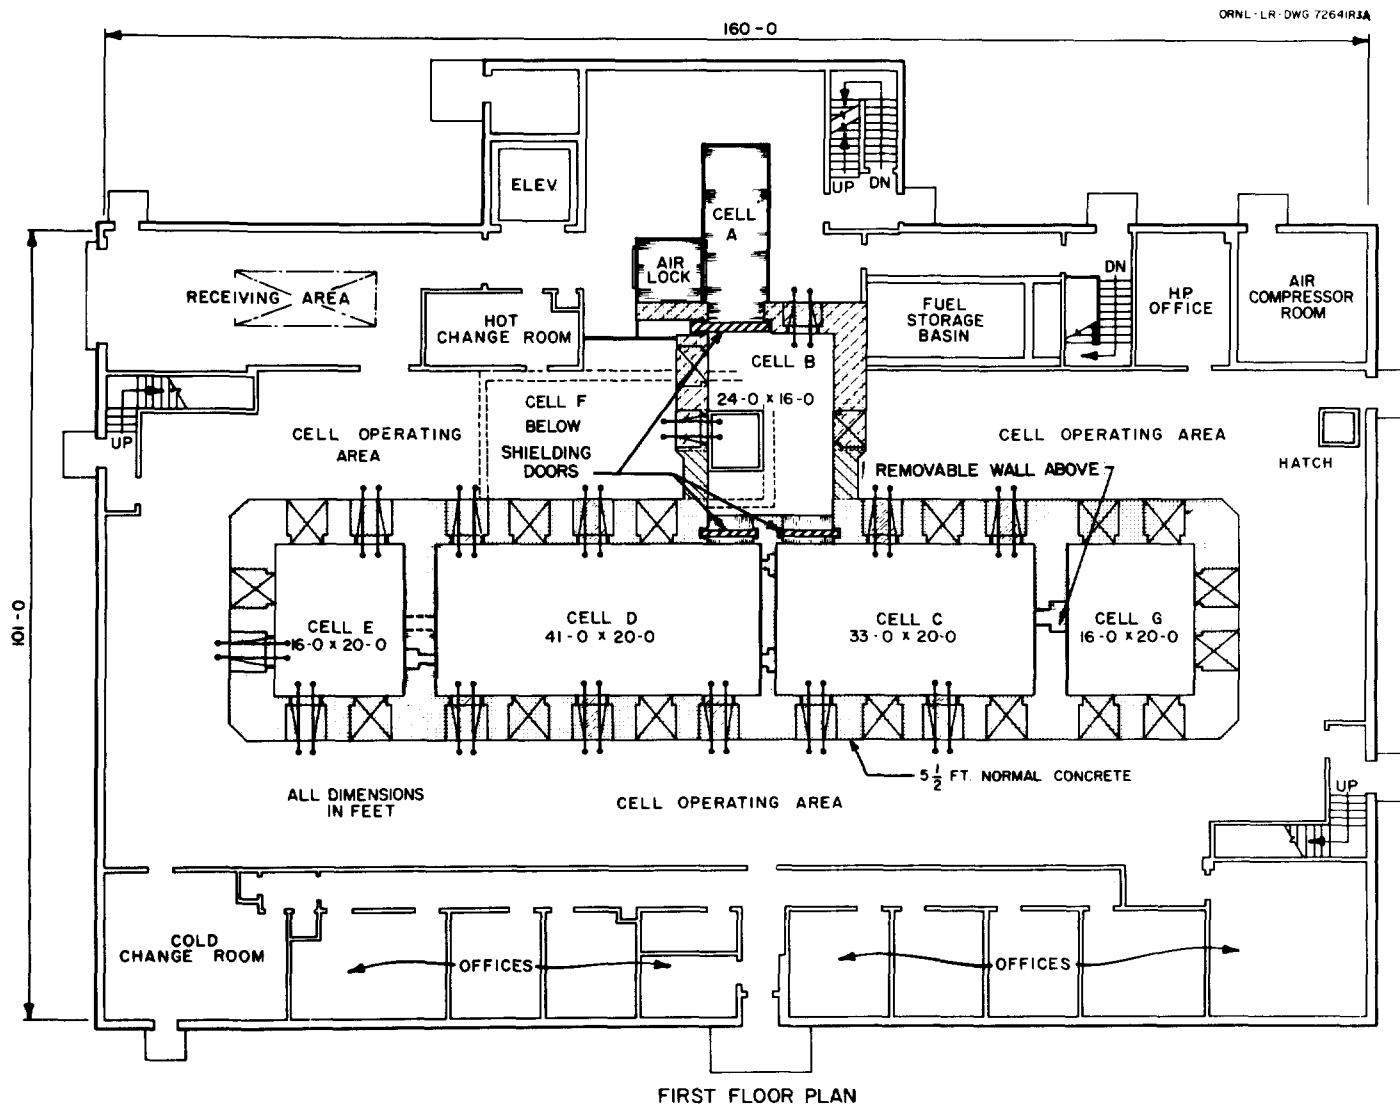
Floor Plan of HTGR Fuel Refabrication Pilot Plant.
